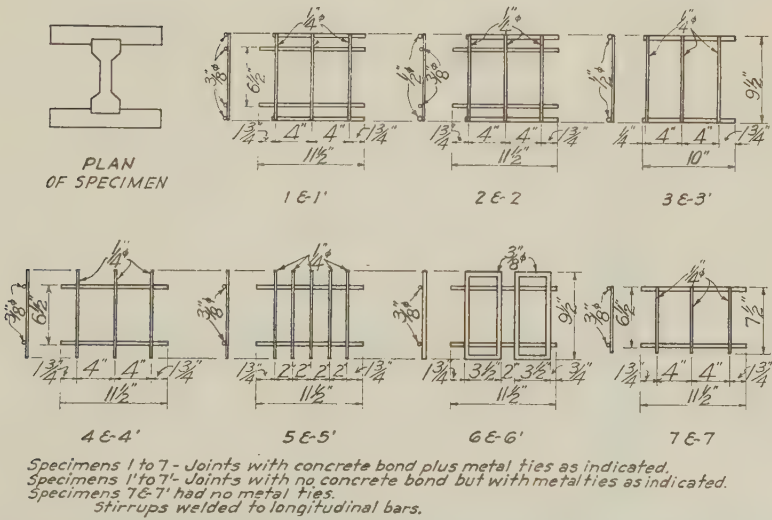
REINFORCEMENT DETAILS, SPECIMENS FOR JOINT STRENGTH TESTS
